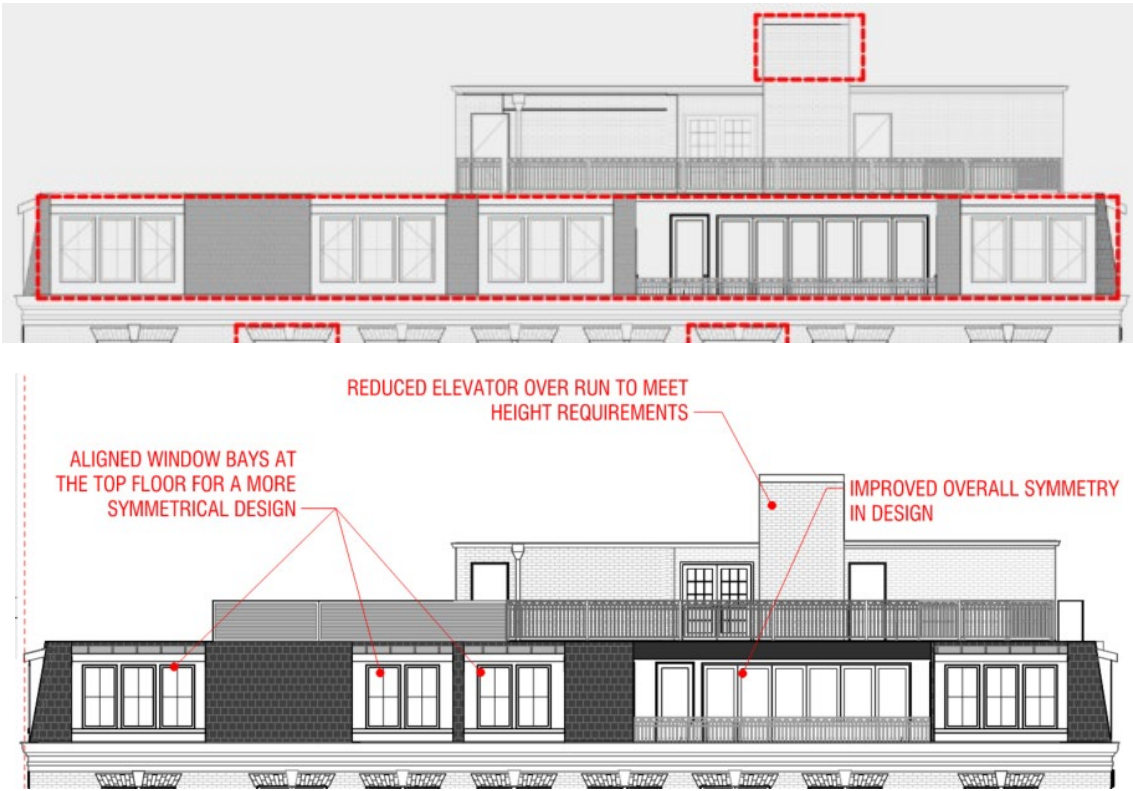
Previous (top) and revised (bottom) north elevation of fifth floor
